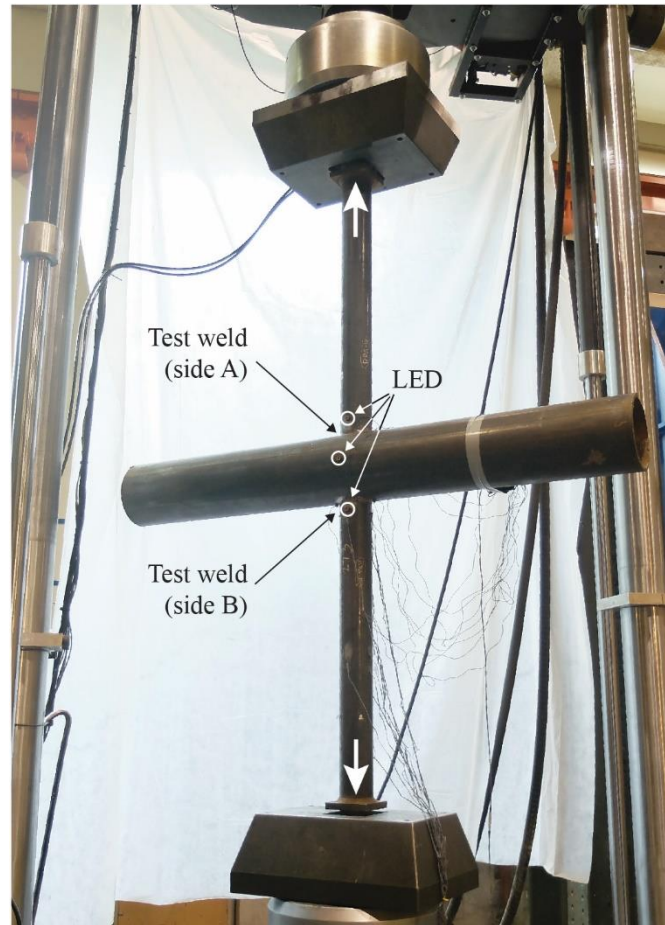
Typical testing arrangement (shown for test 127-273-90a)
